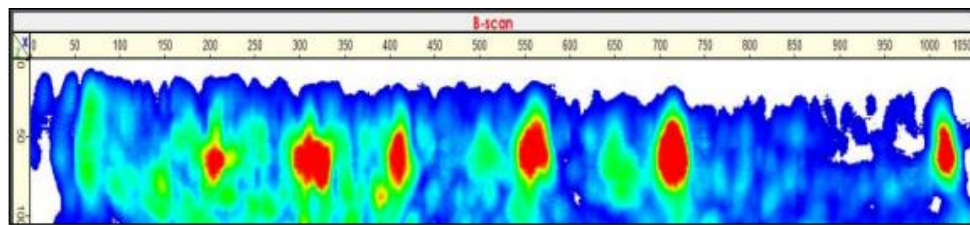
(d): Magnified view of red spots at X=8.9 in., 12.8 in., 16.7 in., 21.7 in., 28.5 in., and 40.4 in.
